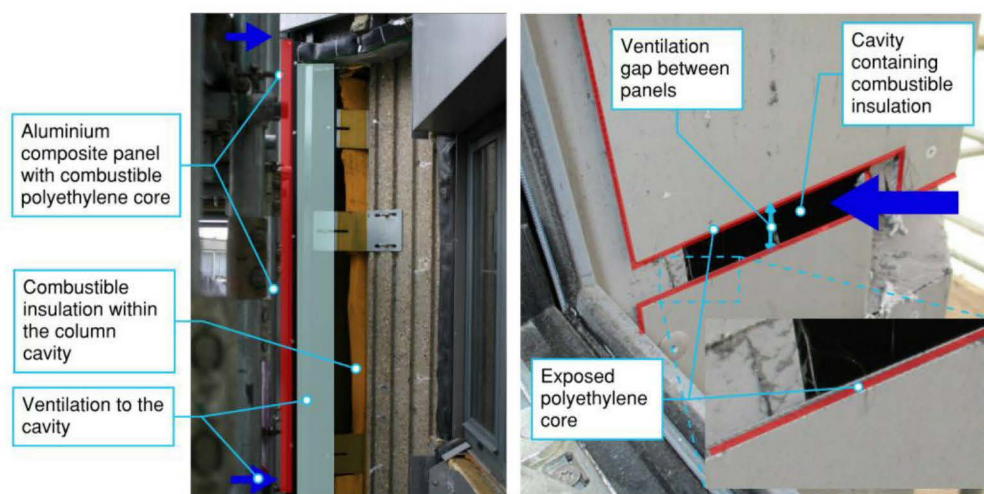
Images of available fuel and ventilation within column cavities from Grenfell Tower site inspection (left image – Flat 13, right image – Flat 11)
